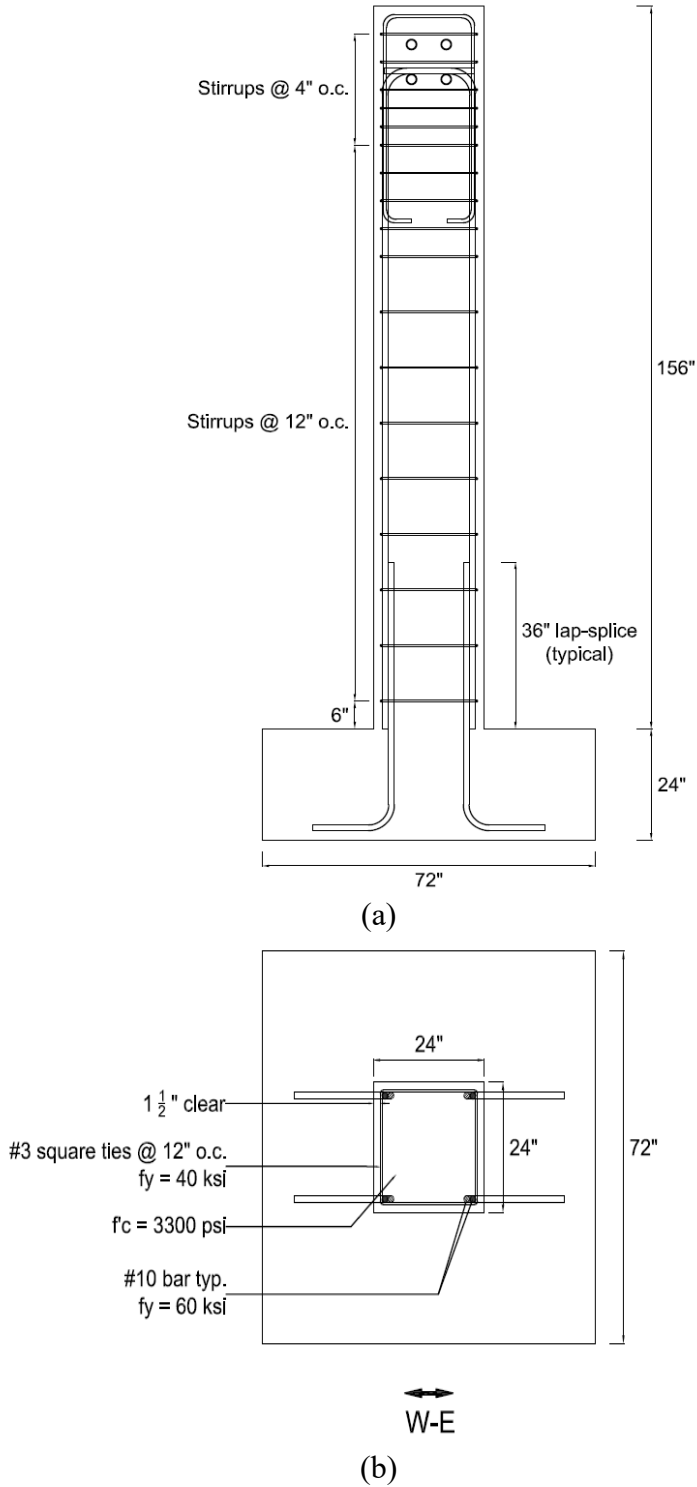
Specimen R-S-R-LSS-90: Dimensions and reinforcing steel details (a) E-W elevation view, (b) plan view (dimensions in inches)
